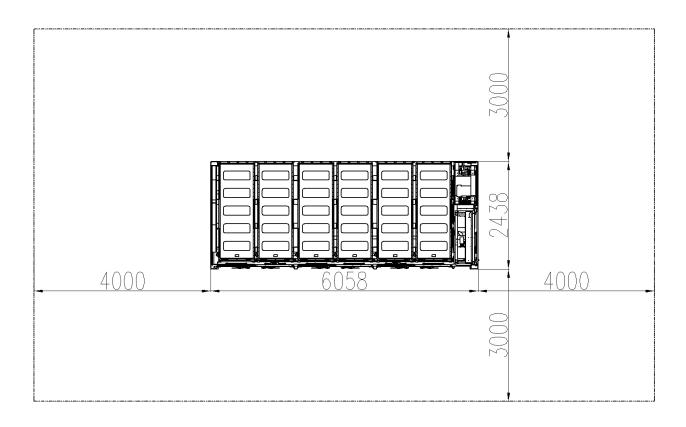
Schematic Diagram of Installation Space Requirements for a Single BESS (Unit: mm)
